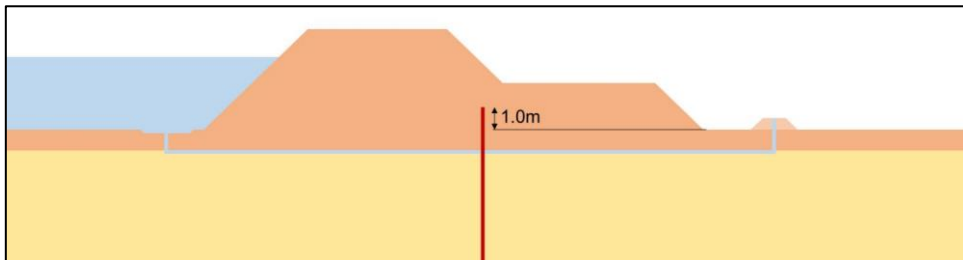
Sheet-pile wall, 1m above ground level (Podt, 2024)
